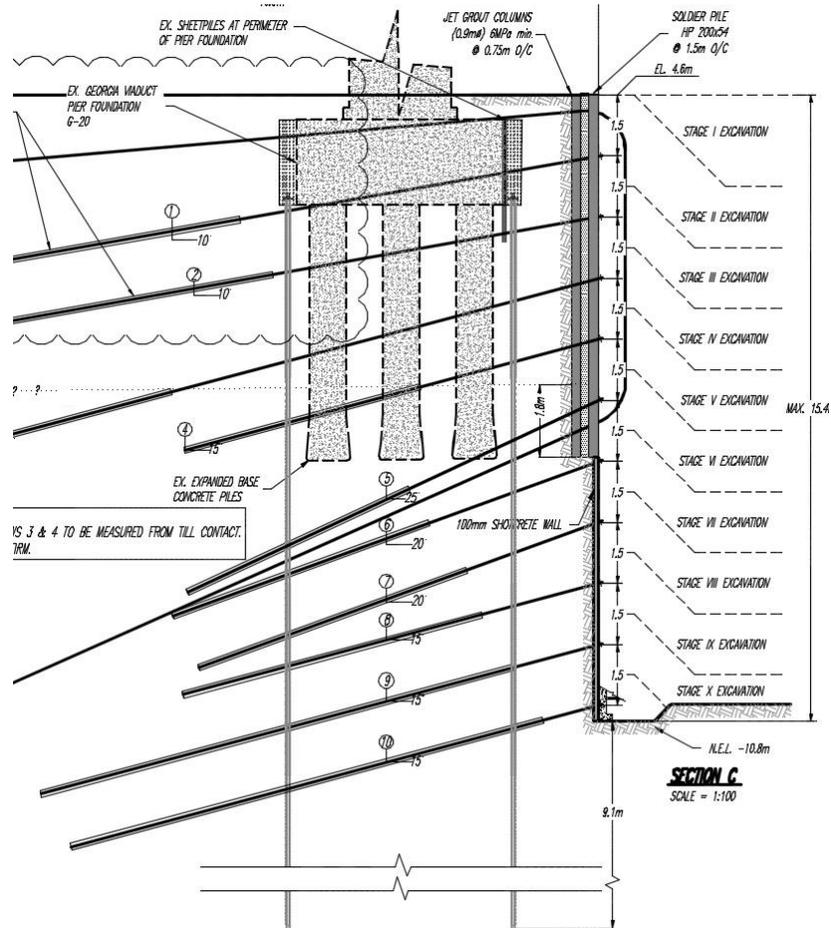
A typical section view of the shoring and underpinning system at the location of pier G-19 (GeoPacific’s Drawing)
